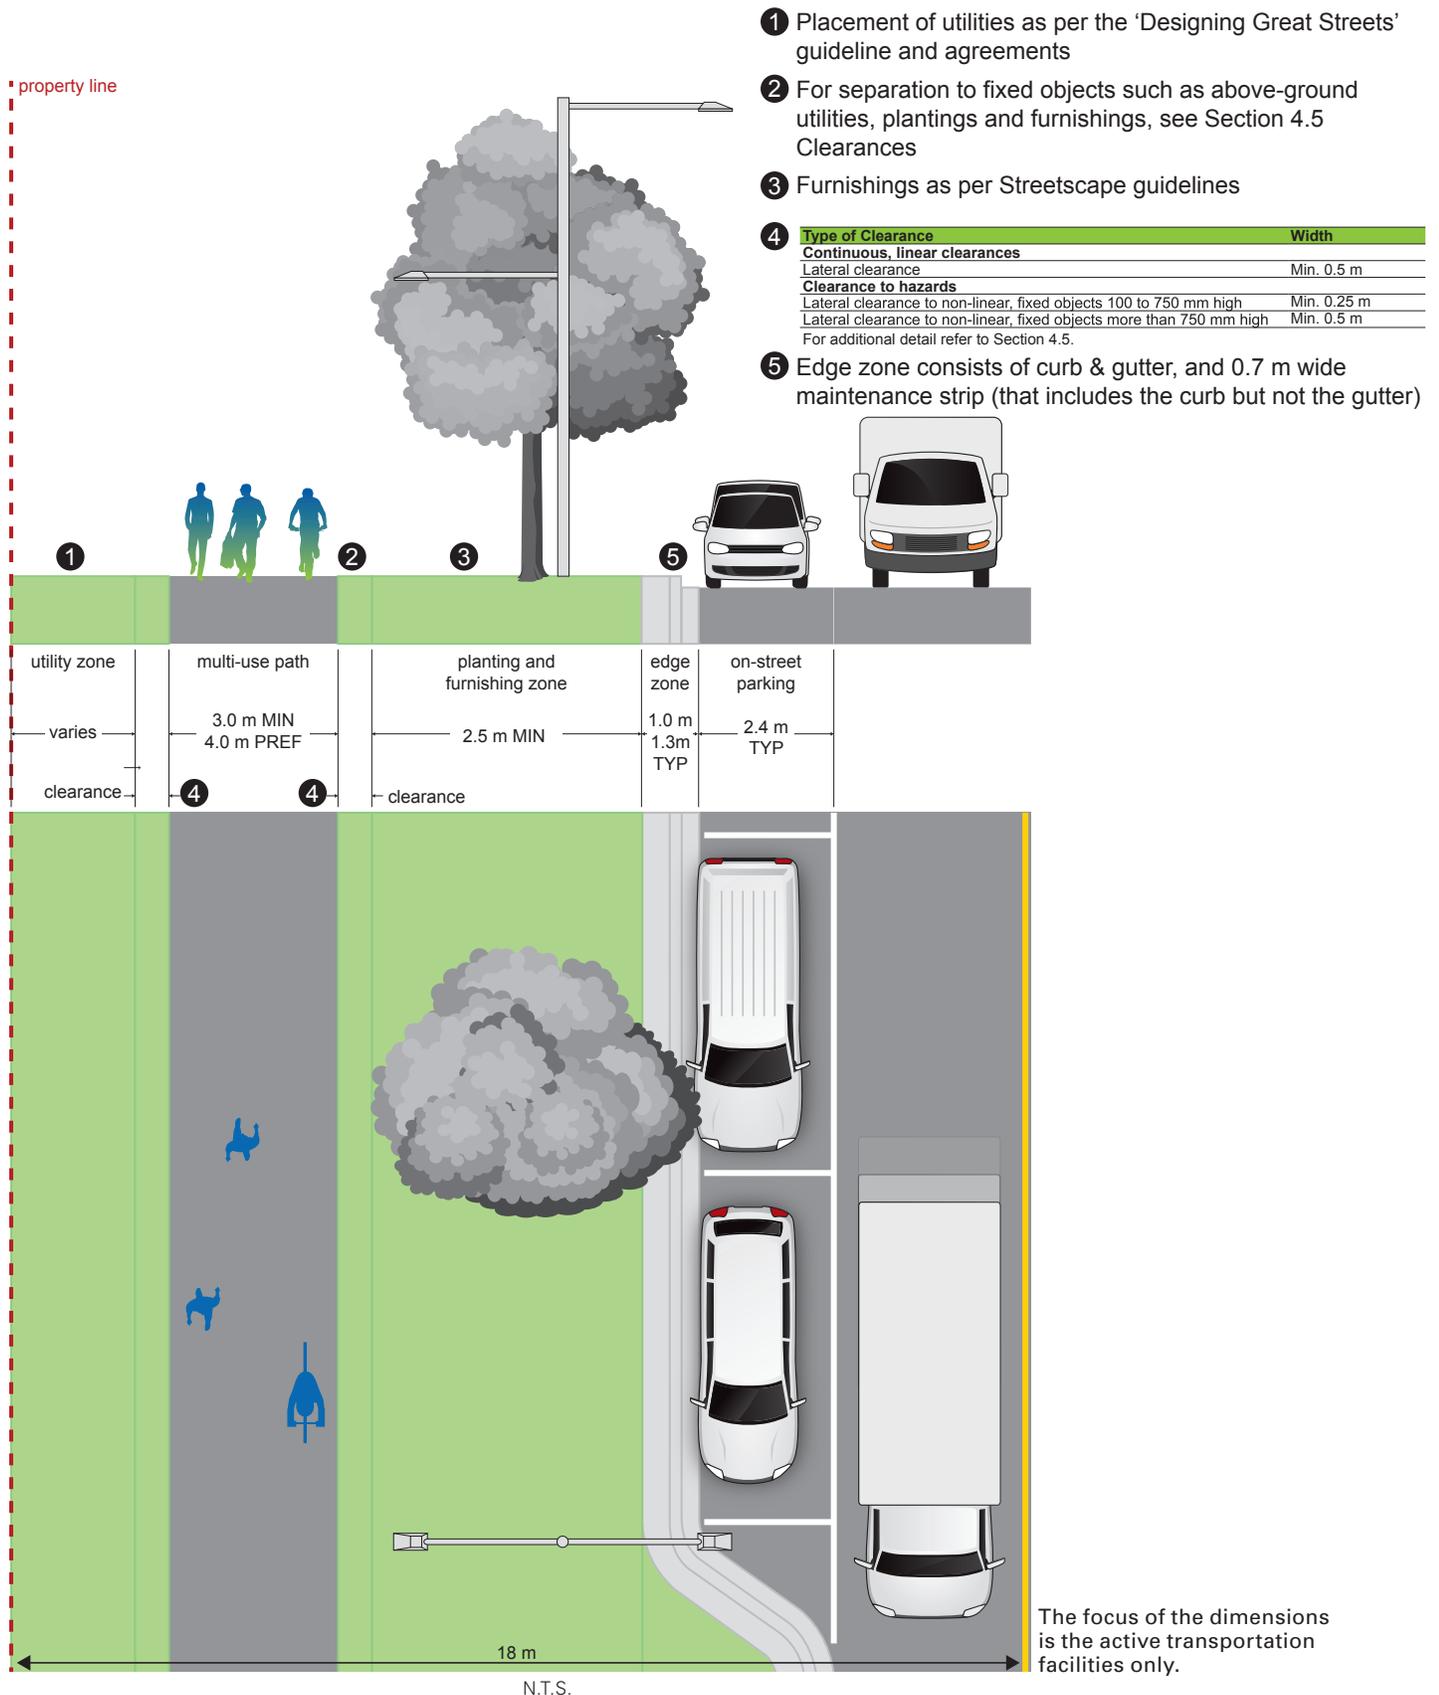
Rural Hamlet Road (36 m ROW) – Multi-use path with two travel lanes and on-street parking
